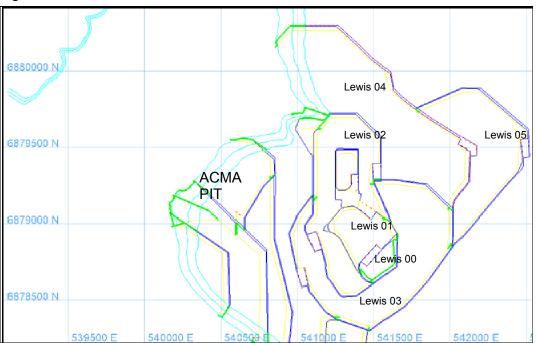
Lewis Phases in Plan at 178 m Elevation
